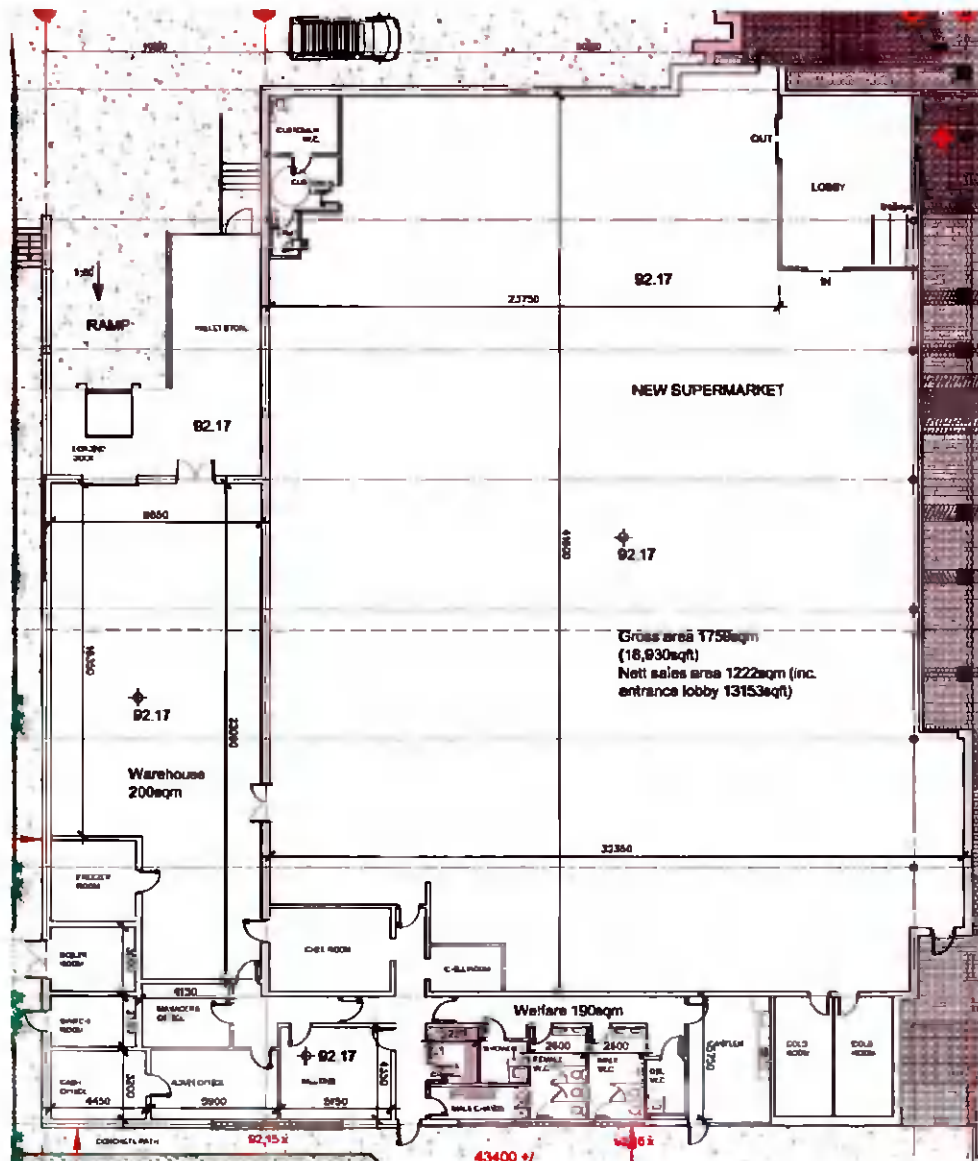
Permitted Floor Plan of Anchor Supermarket Unit (as permitted under Reg. Ref. SD20A/0037)
